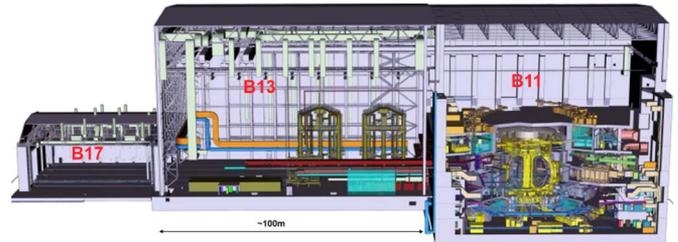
Cleaning facility building (B17), assembly building (B13) and tokamak building (B11).
